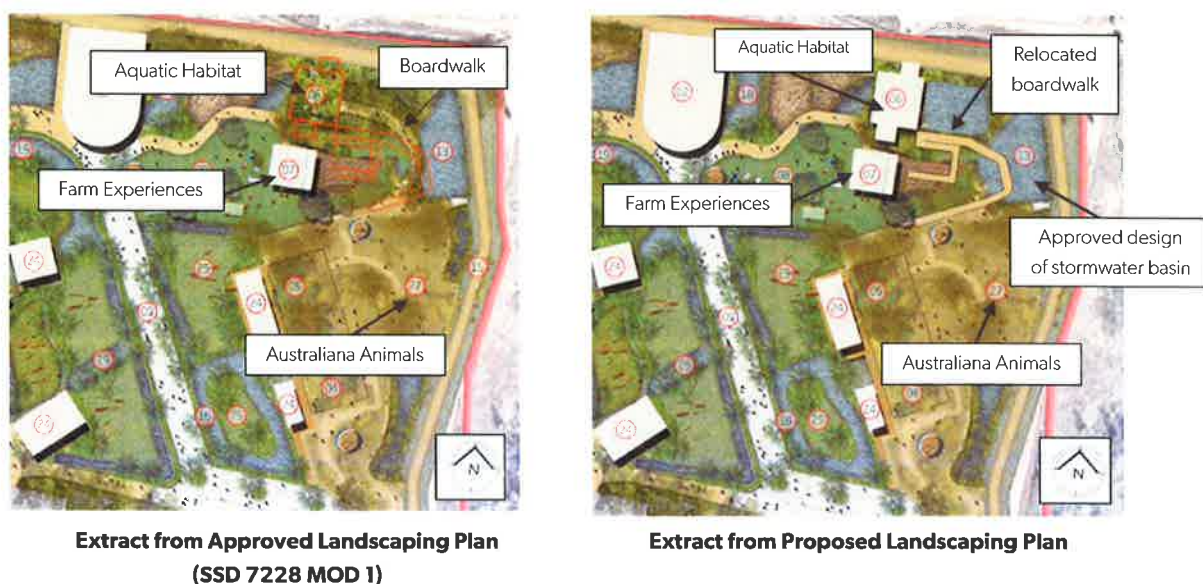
| Proposed Changes to the Boardwalk and the Approved Landscape Plan
